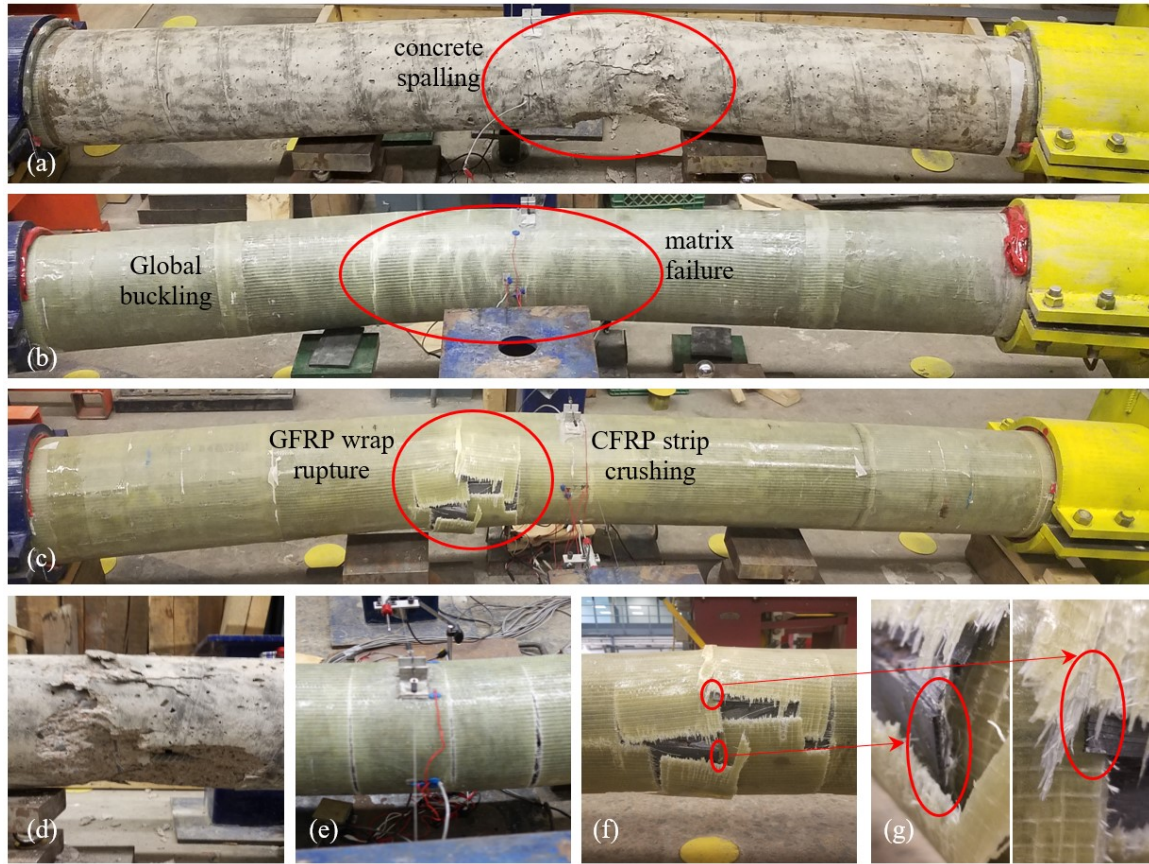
Failure modes for phase II: (a) failed control specimen; (b) failed wrapped specimen; (c) failed hybrid specimen; (d) concrete spalling; (e) matrix rupture; (f) rupture of GFRP wrap; and (g) crushing of CFRP strip.
